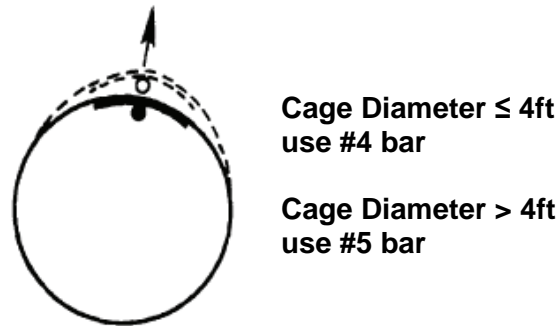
Possible Distortion of Poorly Assembled Cage Due to Pickup Forces or Hydraulic Forces from Fresh Concrete
